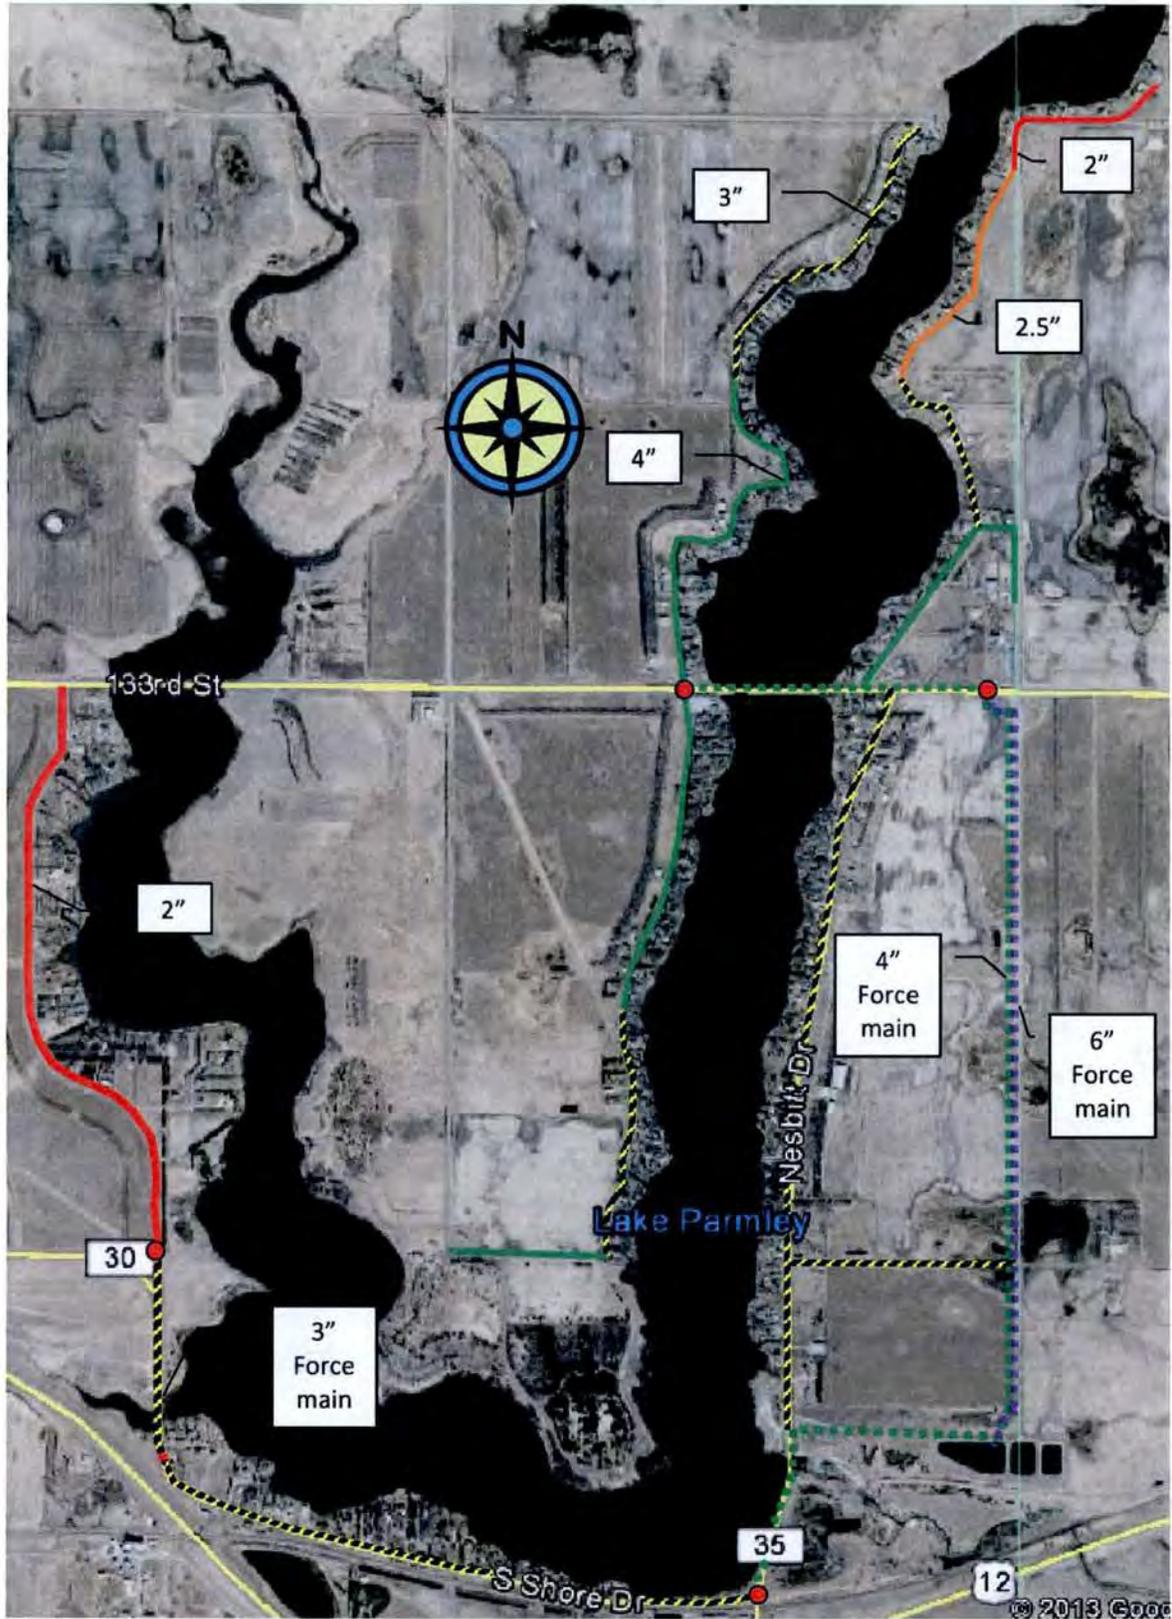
Layout Map with the Addition of West Lake
